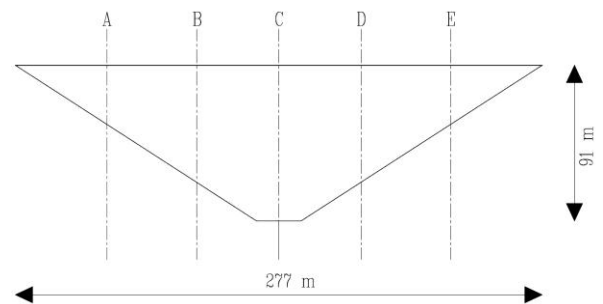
Cross-sections A, B, C, D, and E for installing instruments on a longitudinal section of Vanyar dam
